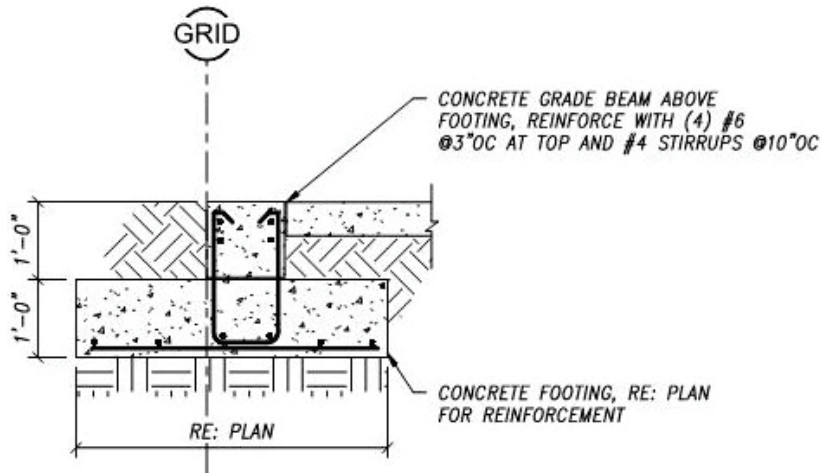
Commercial building foundation detail for COM2 archetype on soft soil.
